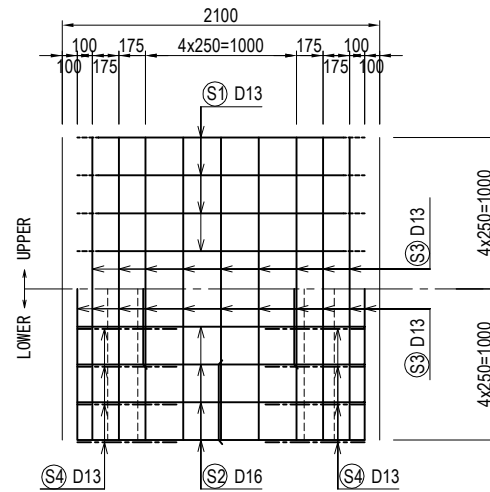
DETAIL OF BOX CULVERT TYPE 1500 x 1500
